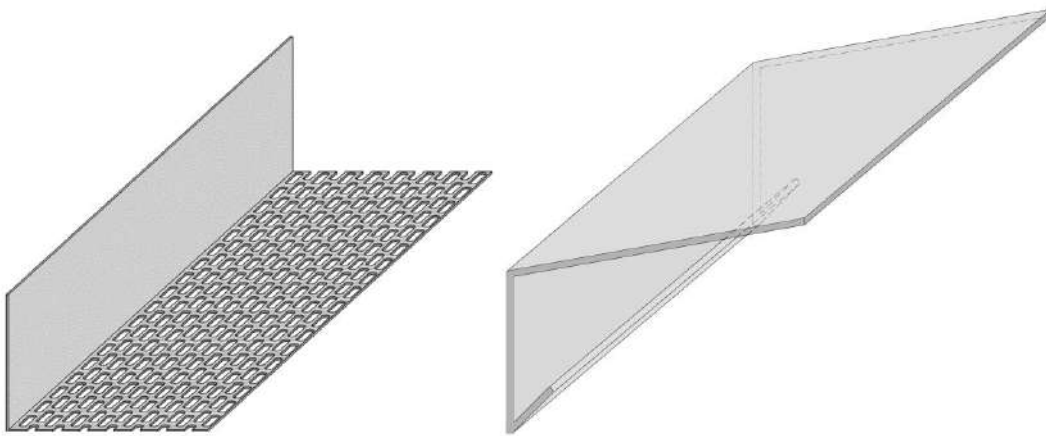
Example of standard sections available for metal grilles and flashings used to protect the ventilated cavity.
